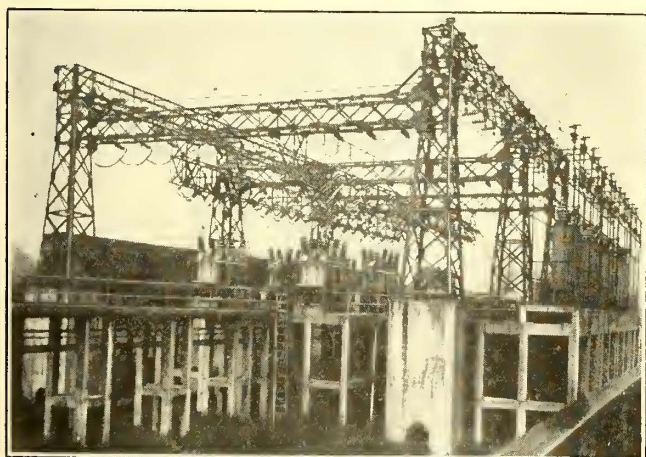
OUTDOOR SUBSTATION AT WINDSOR PLANT
